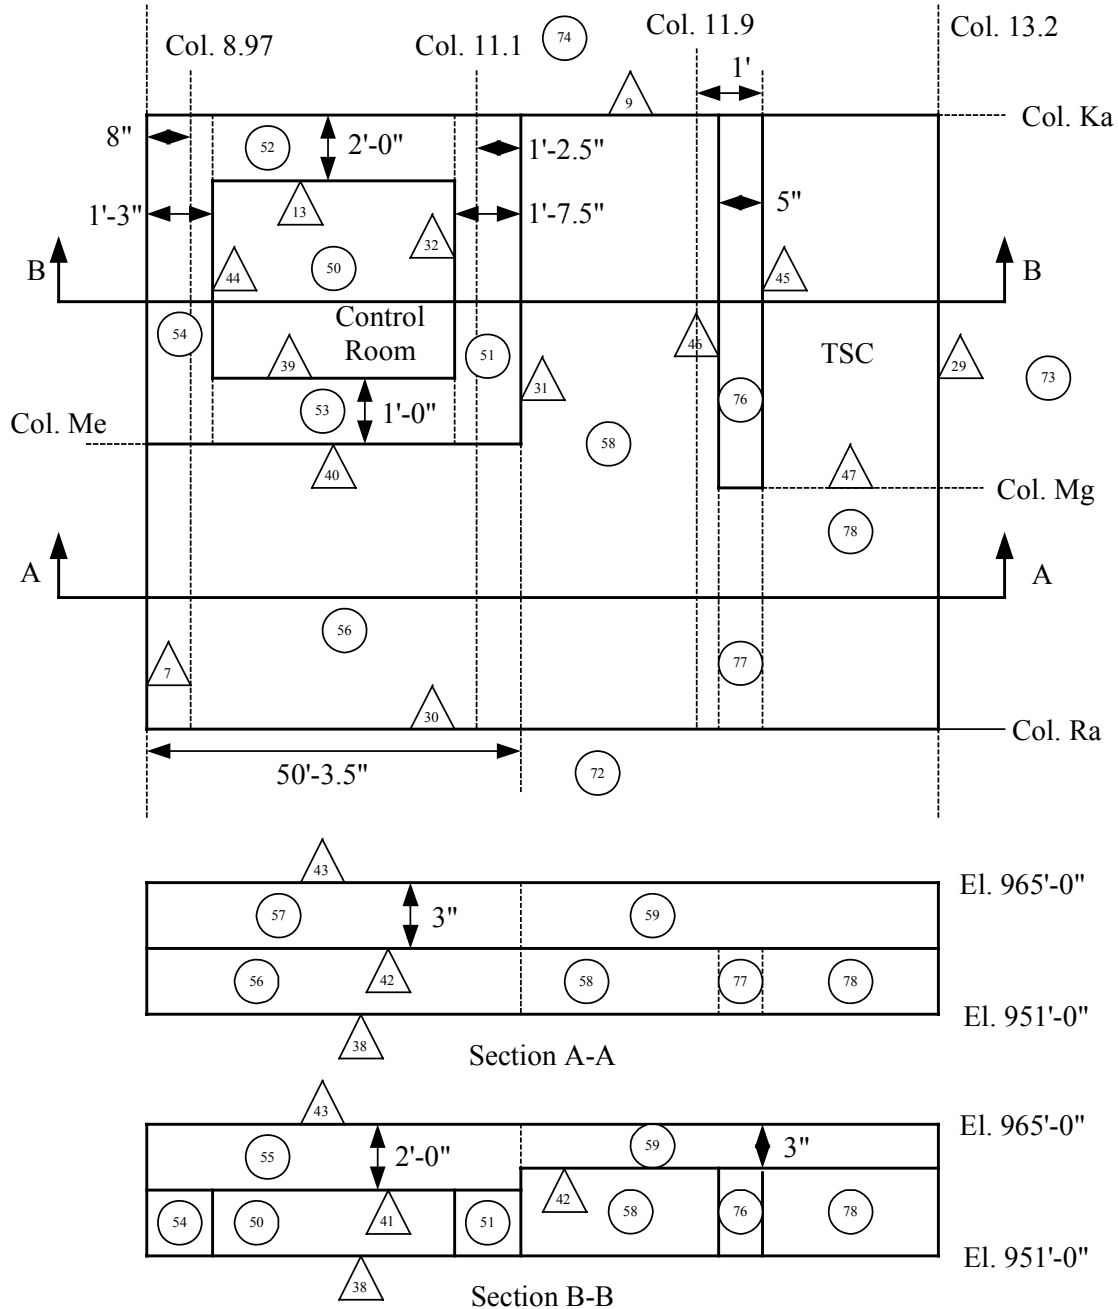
Geometry Model for the Control Building, Elevation 951'-0" (Not to Scale)
